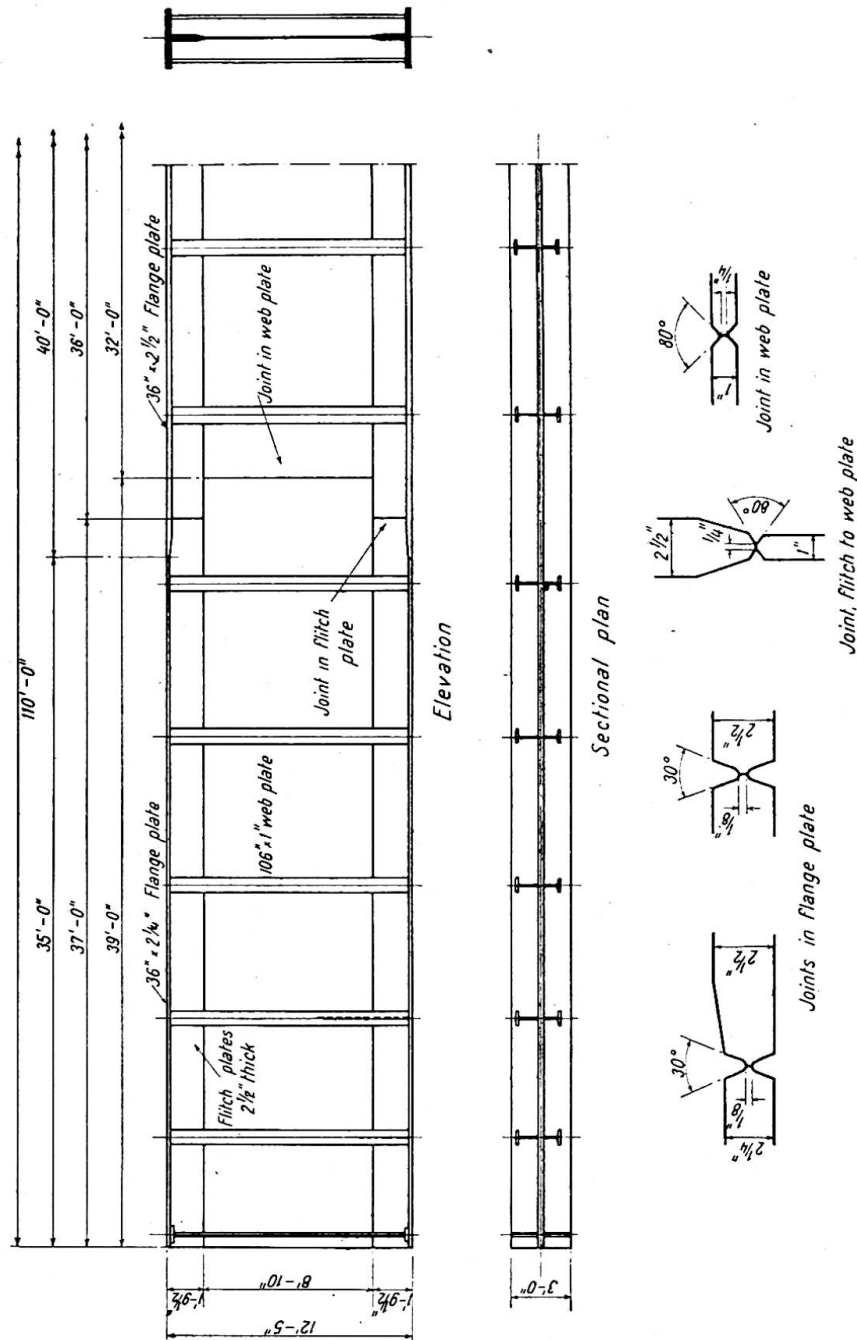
Welded crane girder 110 ft. 0 in. span. Approximate weight 90 tons
